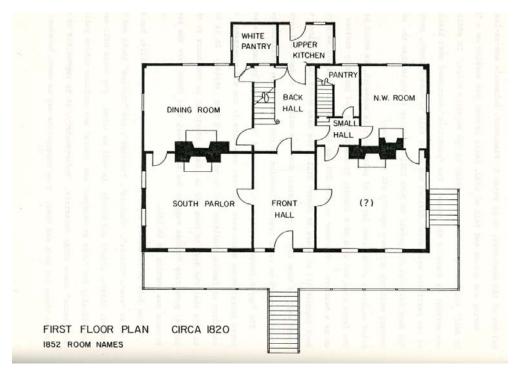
First floor plan, Cherry Hill, as it was in 1820.
